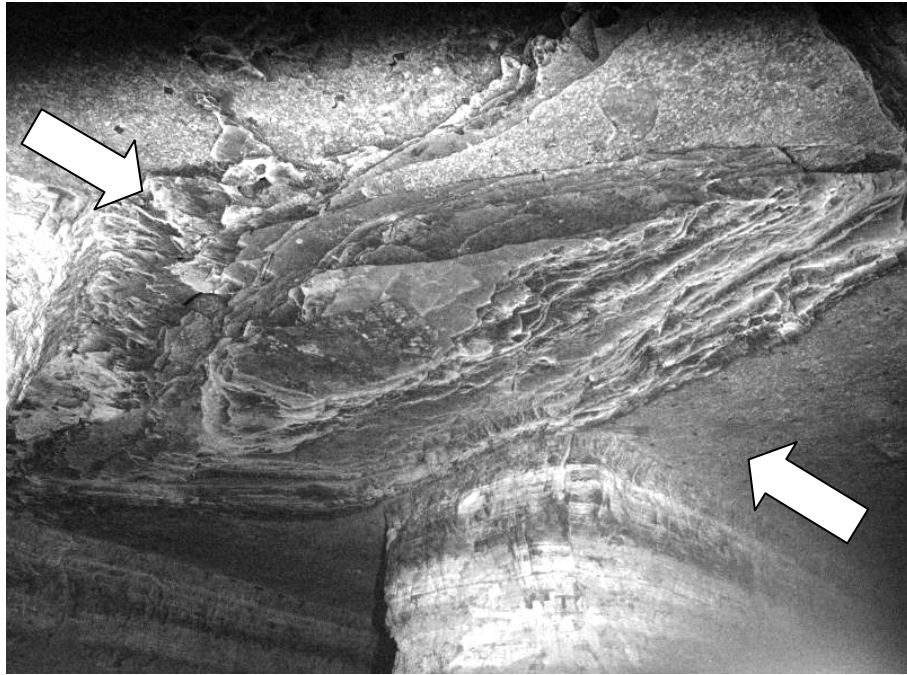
Horizontal stress induced roof failure that initiated between two pillars. Arrows show direction of maximum horizontal stress.
